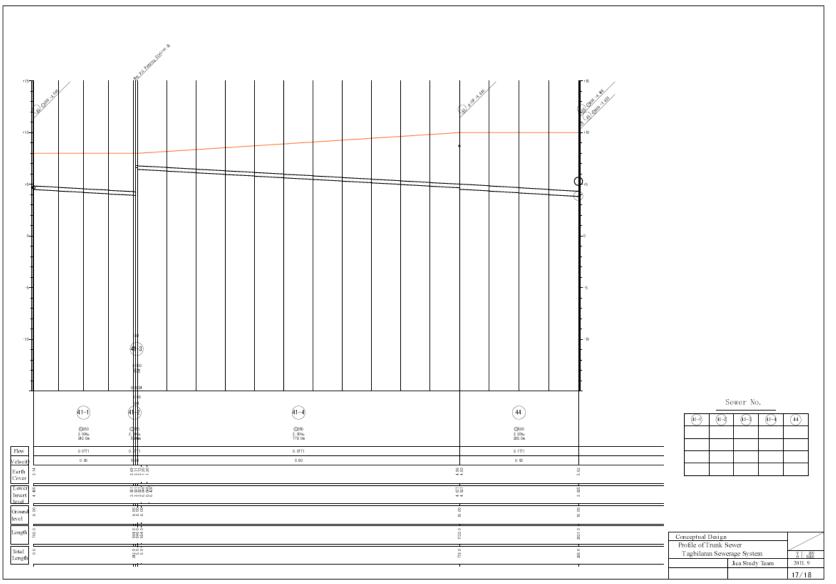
Profile of Trunk Sewer (Tagbilaran Sewerage System)
